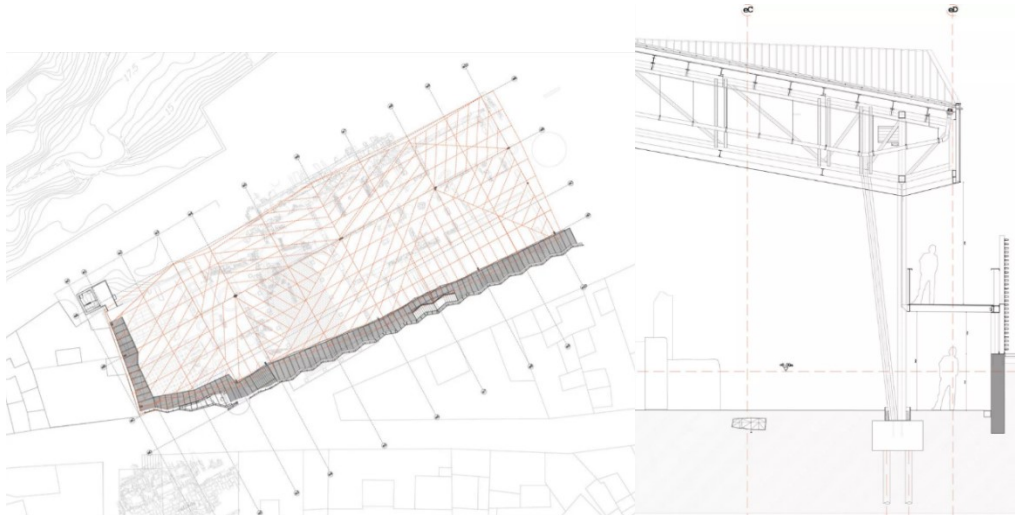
Canopy in Cartagena, Spain, Plan and Cross section of the roof.
